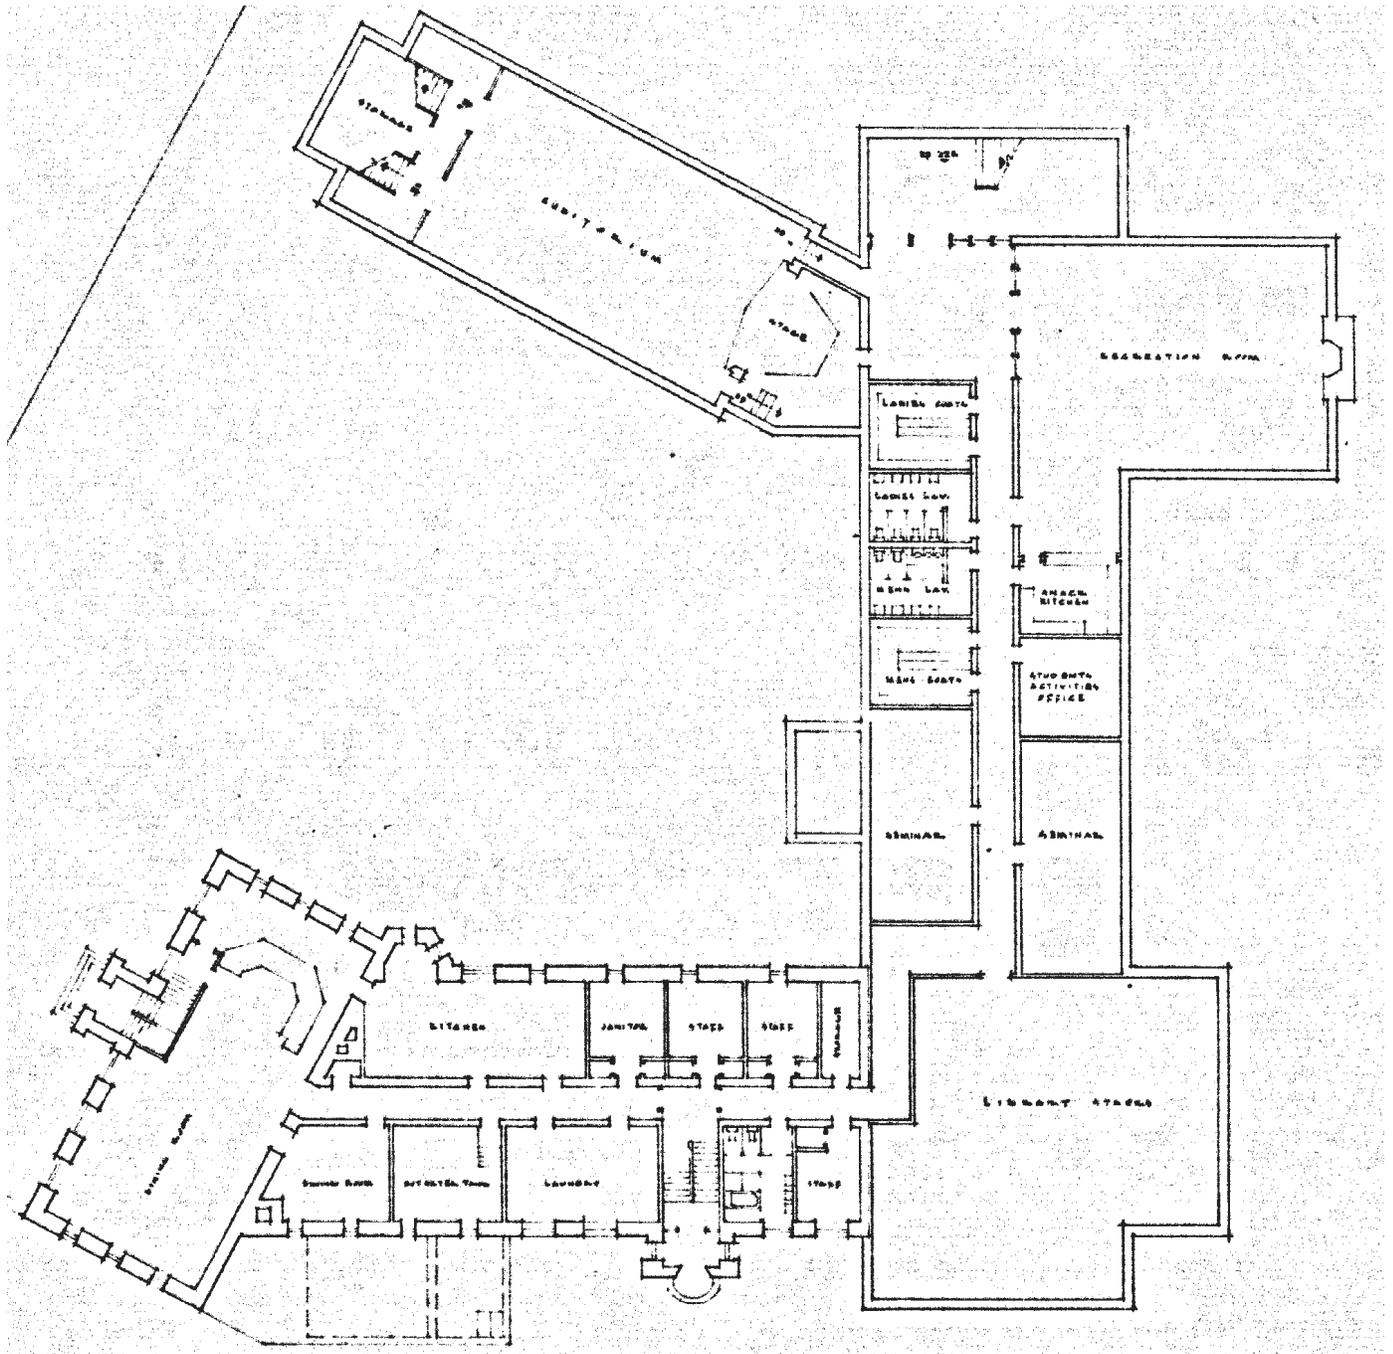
Basement floor plan of St. Andrew's College after completion. Retrieved from Asset Record System, File SC-41-T.
